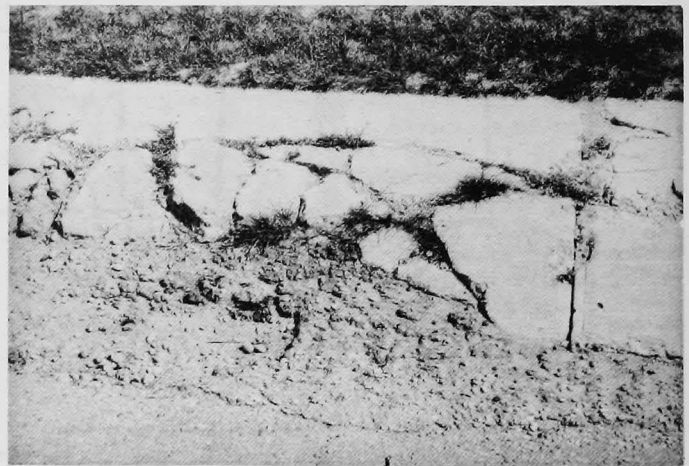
Destruction of curb and sidewalk by sulfate corrosion and swelling clay.
